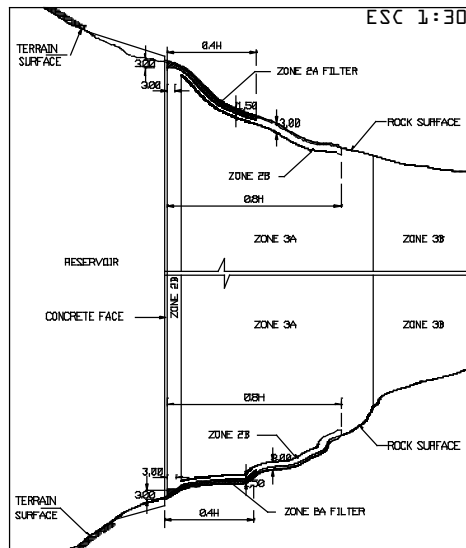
Sogamoso dam: Additional foundation protection by filter layers
